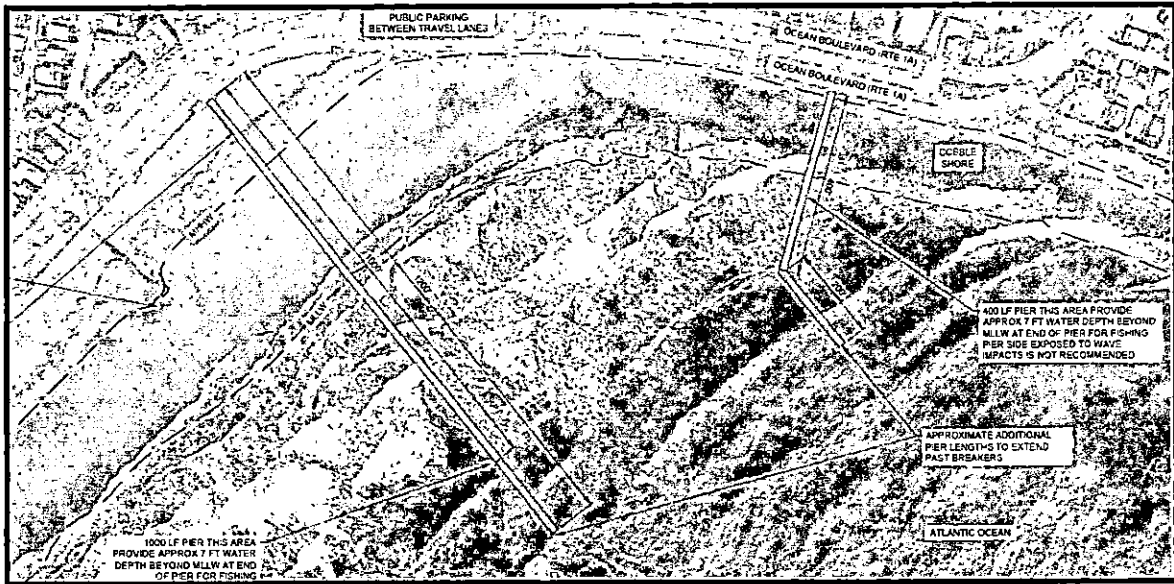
Portion of Area 1 (North End) Proposed Pier Location Options Concept Plan
